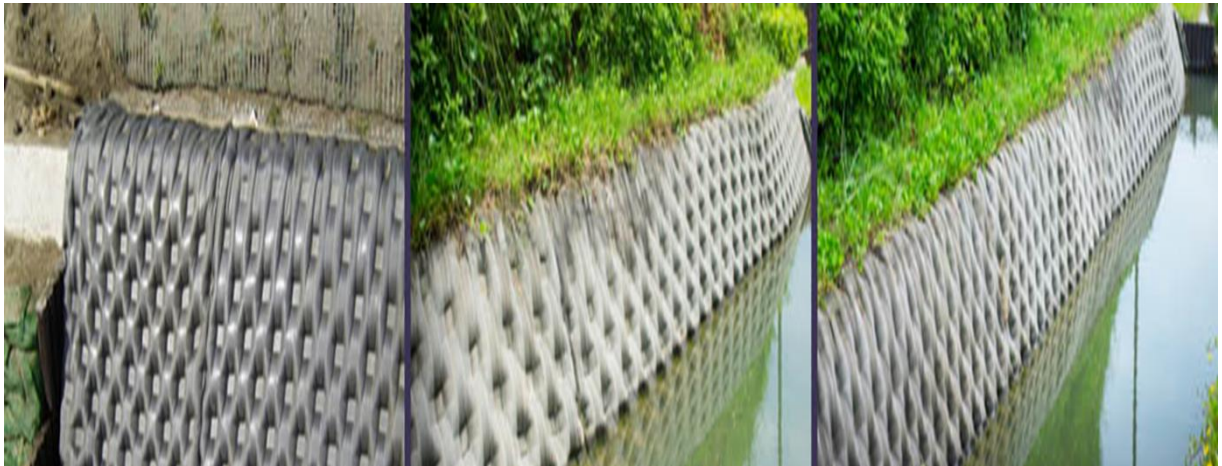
Geotextile grout filled mattress (Courtesy: web)
